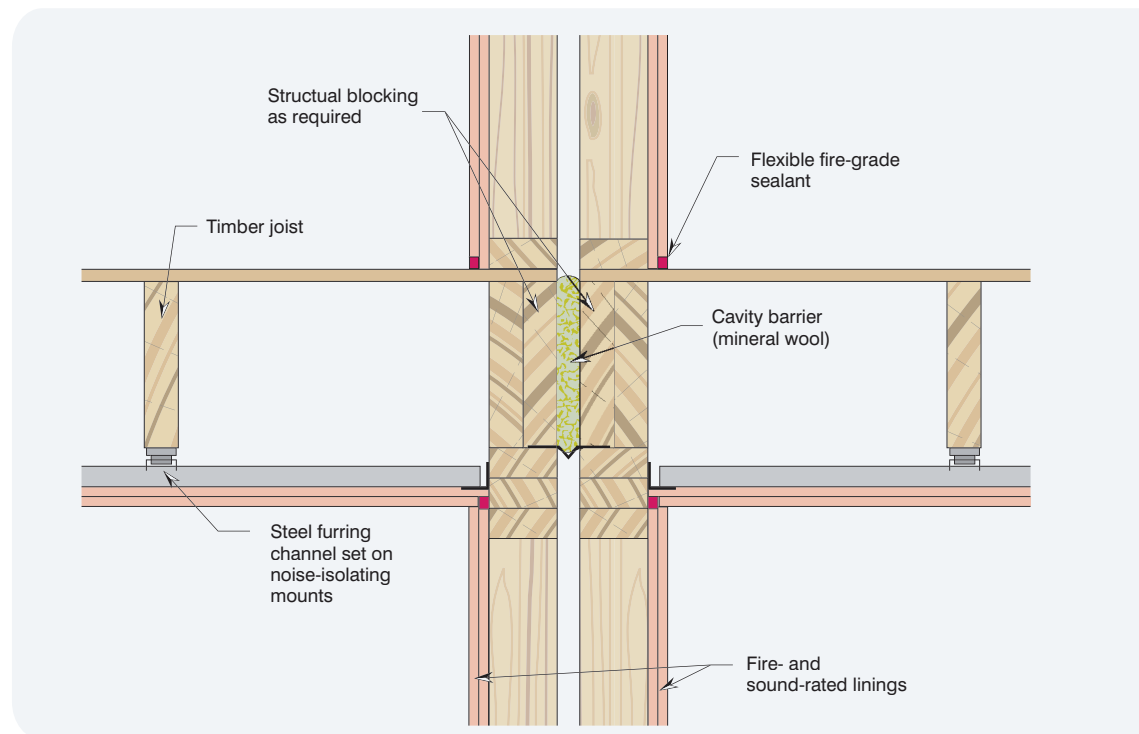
Cavity barrier at the junction of fire-rated floor and fire-rated wall – elevation view.
